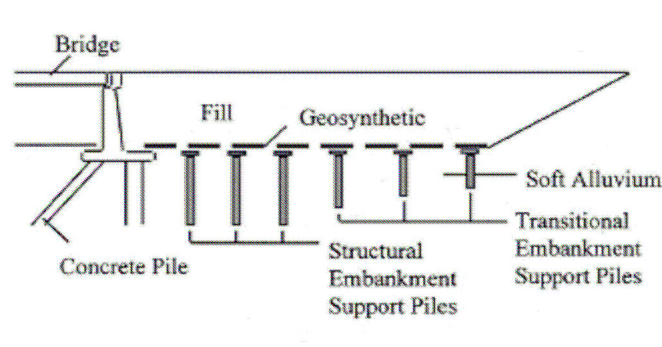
Bridge Approach Support Piling (Reid and Buchanan, 1984)
